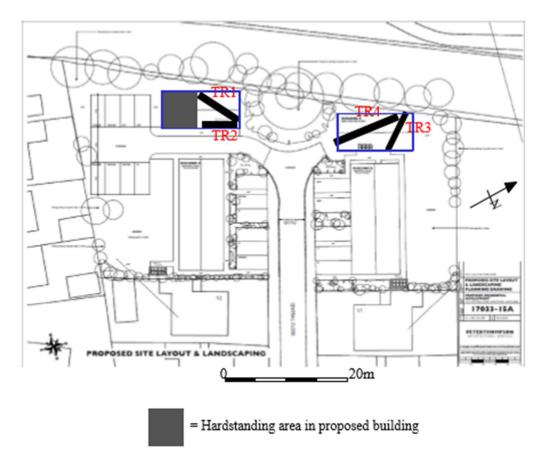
Excavated Trench Plan with Proposed Building C to the left
